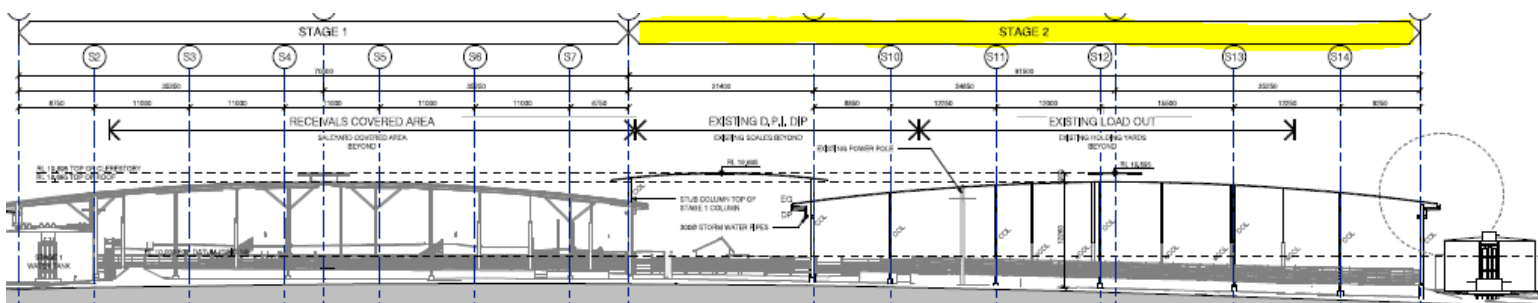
Proposed new roof structure adjacent Stage 1 roof
